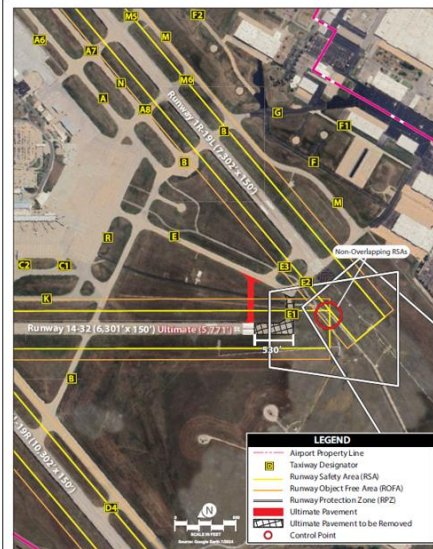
C: Alternative 1 – Shorten Runway 14-32
